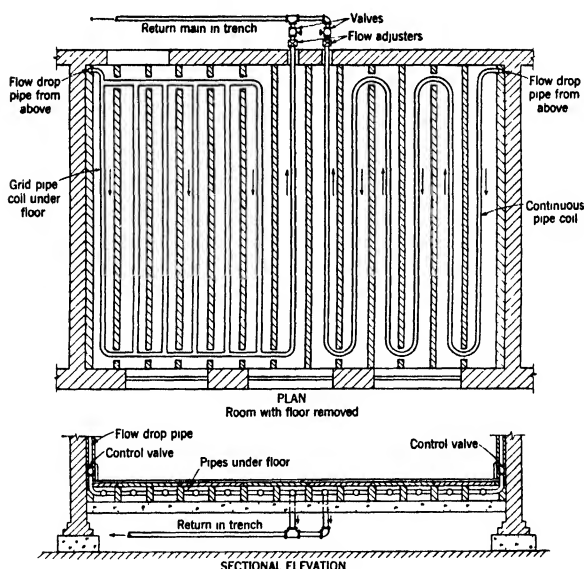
ARRANGEMENT OF CONTINUOUS PIPE COIL IN FLOOR CONSTRUCTION
